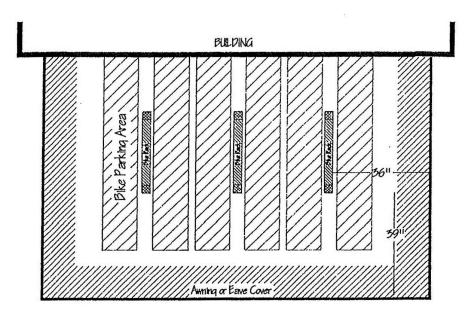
<u>C</u>,10.a. Covered Bike Parking Layout
